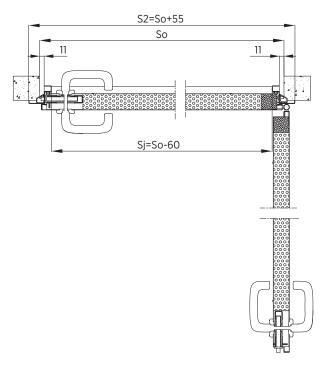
Installation of the ECO BASIC UNI 40 door with a corner frame – horizontal cross-section.
